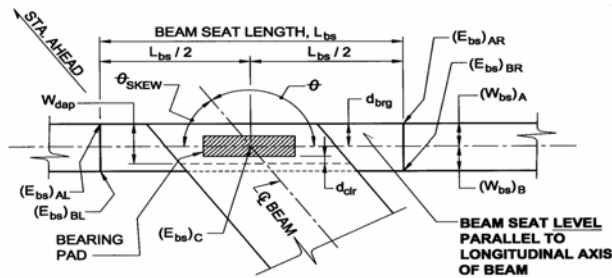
2.5P-1 – Typical Beam Seat Detail (Far End of Beam Shown)
